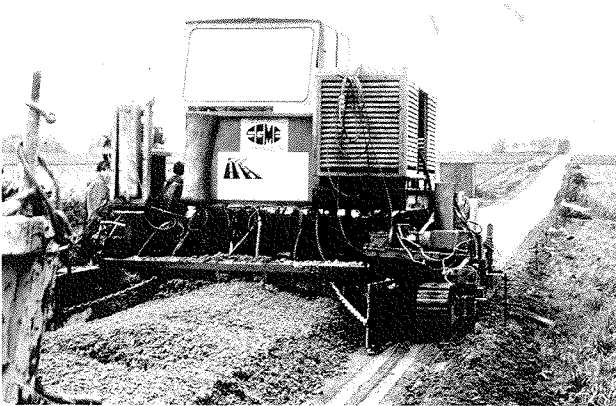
Small slip-form paver for roads 3- to 5-m wide.
